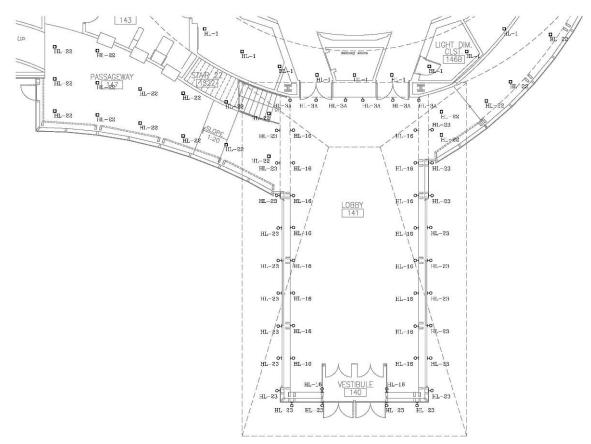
Reflected Ceiling Plan (Existing Layout)
